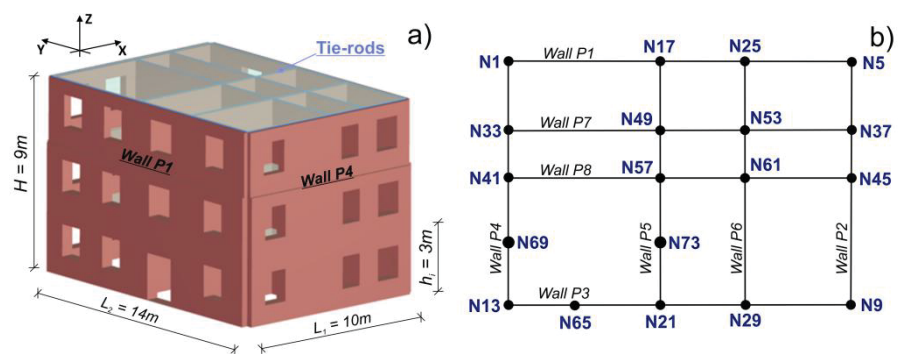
a) 3D view and b) foundation level of the modelled masonry building.
